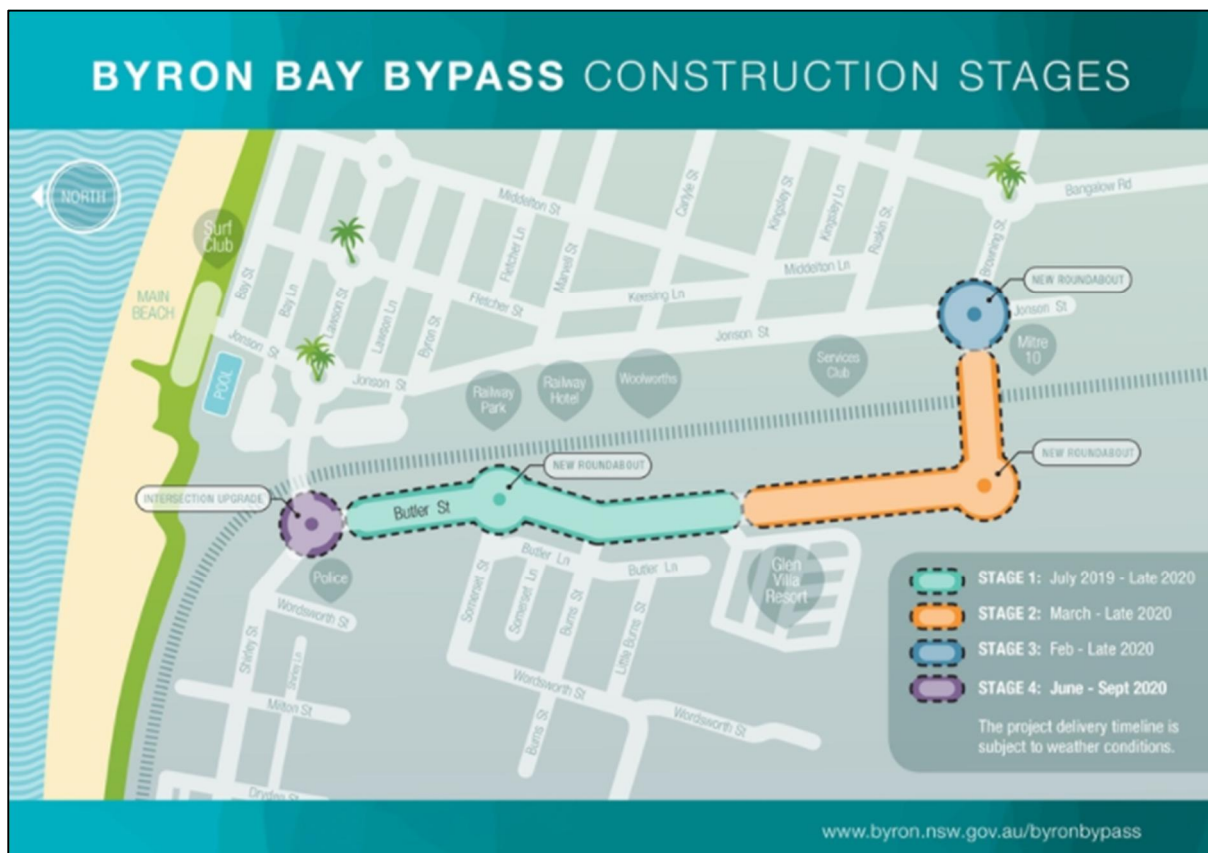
| Byron Bay Bypass Overall Layout Plan (Source: BSC)
